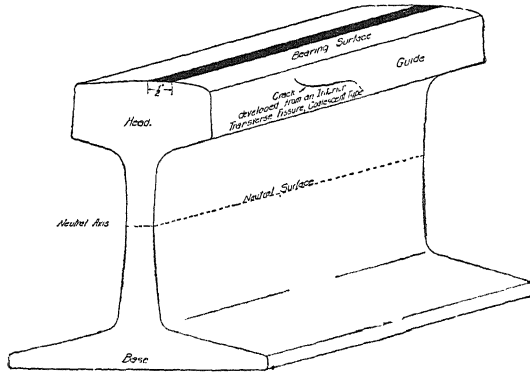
A 6-IN. 100-LB. SECTION THAT SHOWS A CRACK ON SIDE OF HEAD WHICH IS COMMON TO COALESCENT TYPE OF FISSURE, DUE TO UPSETTING OF METAL TO SHORTEN HEAD AND LENGTHEN BASE.
